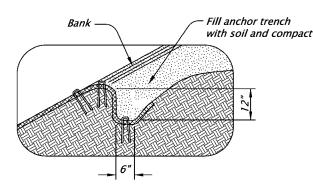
TOP OF BANK ANCHOR TRENCH, H<3' NOT TO SCALE
